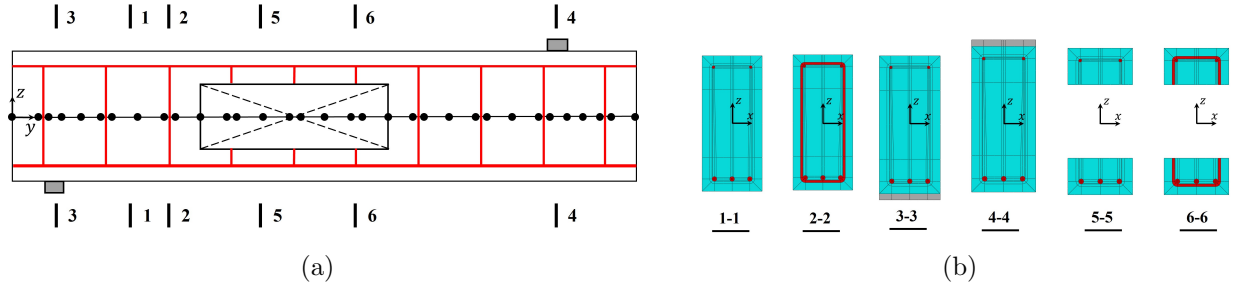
(a) FE discretization of beam elements and (b) cross-sectional discretization for the RC beam with web openings
